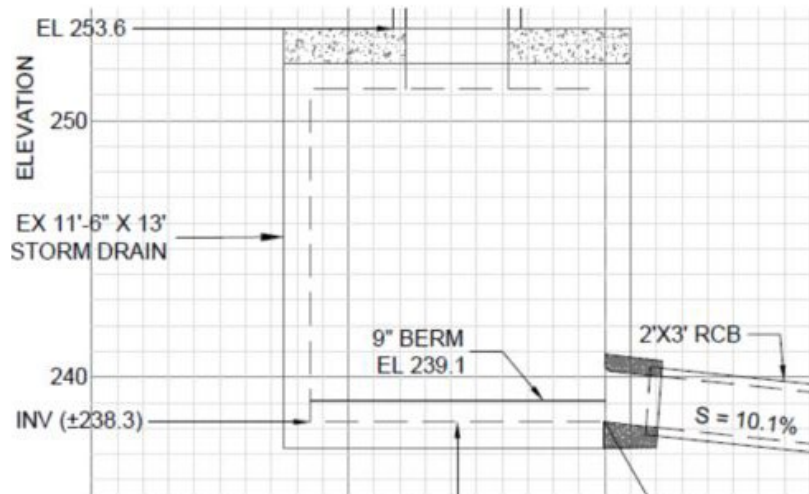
Example Diversion Berm and Side Outlet Pipe Detail
